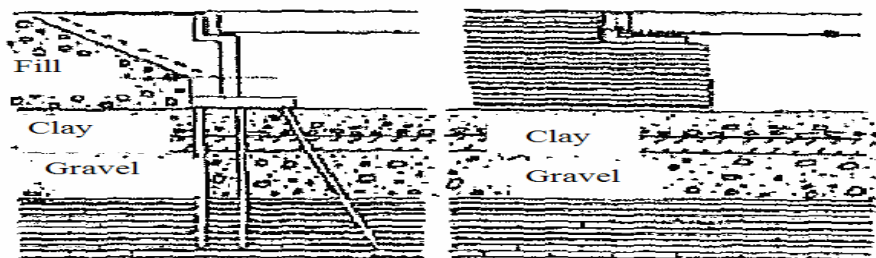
Solutions by reinforced earth method -bridge piers (Craig, 1987)
